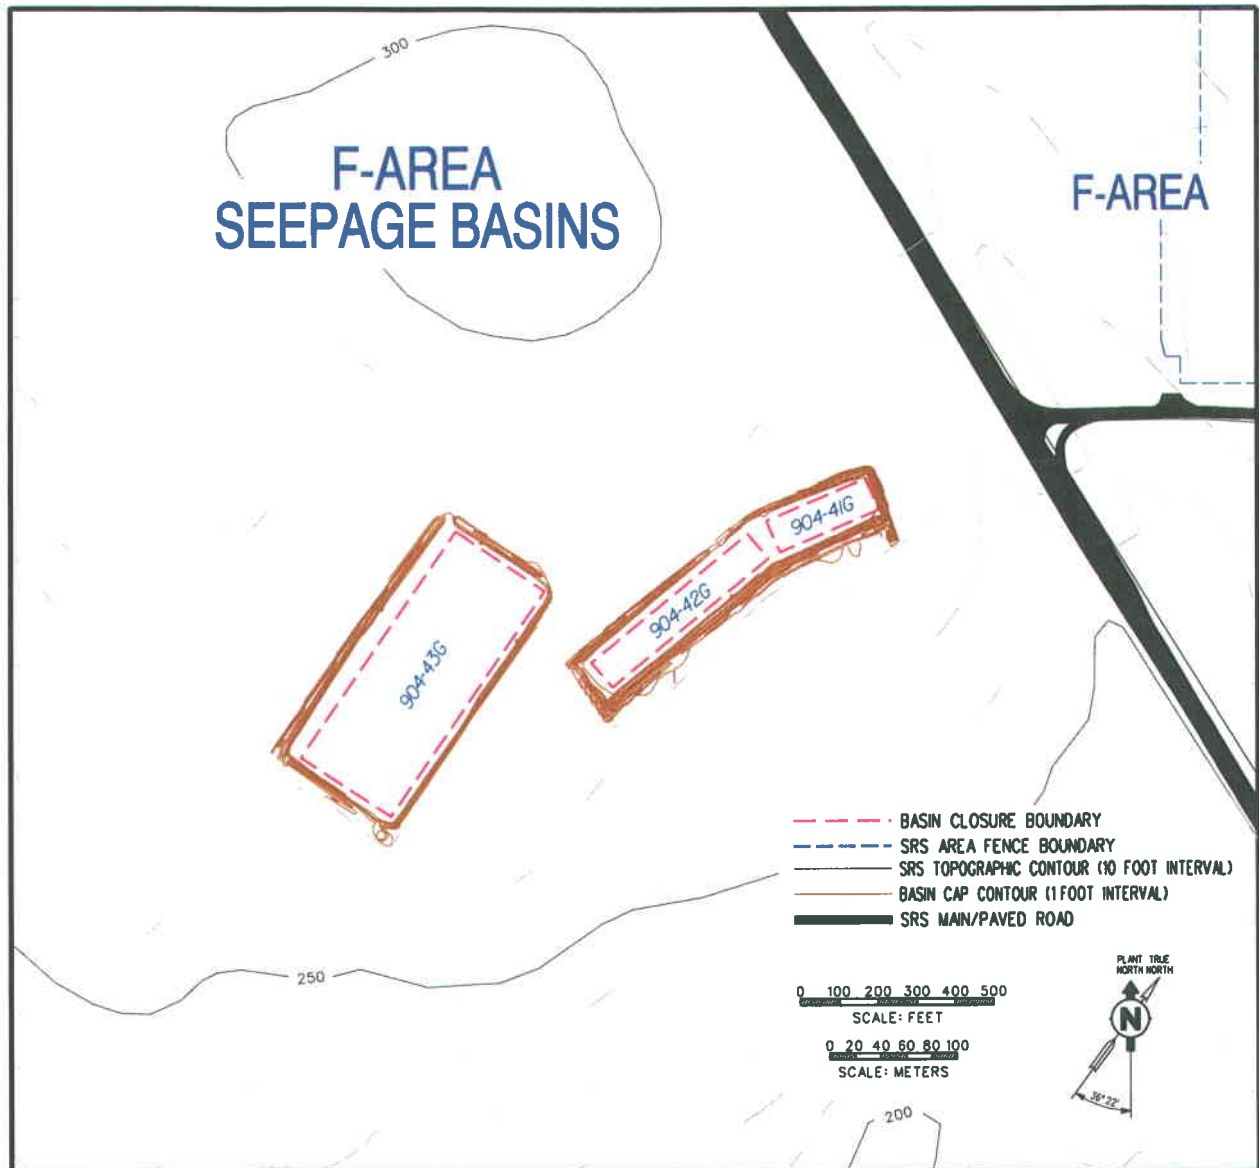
Site Layout for F-Area Hazardous Waste Management Facility
